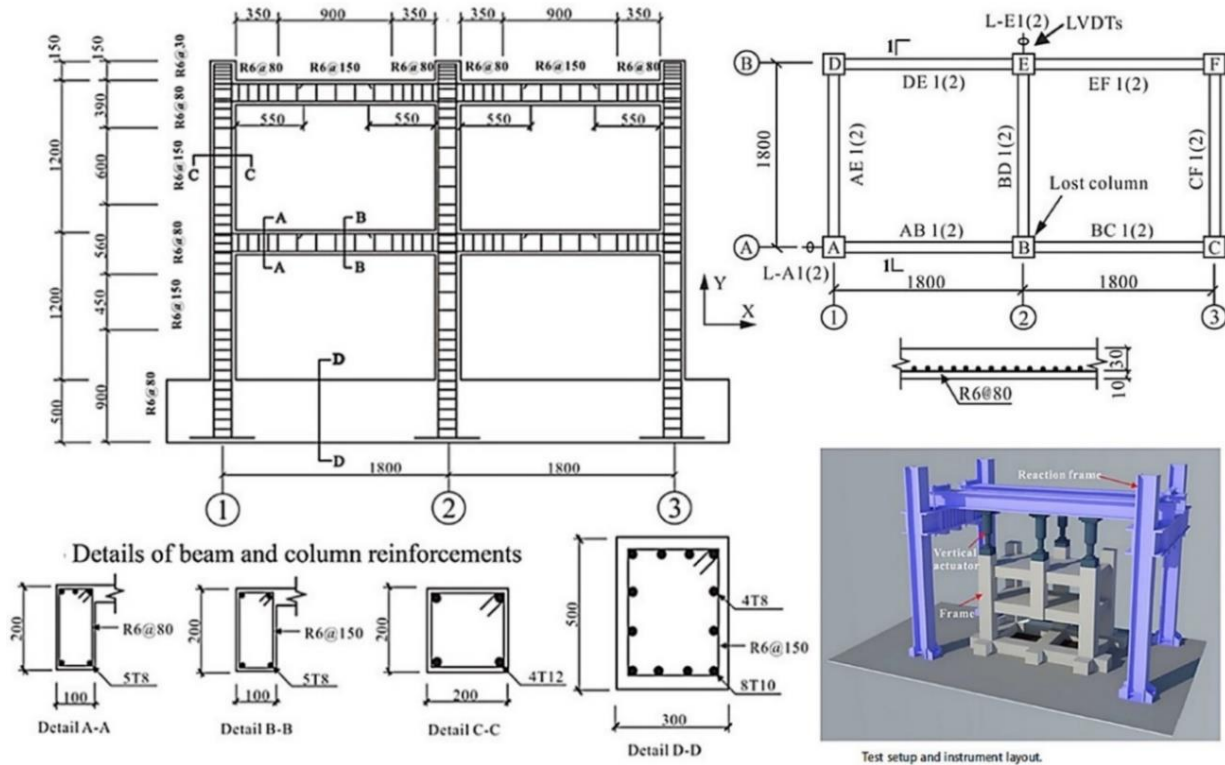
Dimensional details of RC frame structure columns and slab, and loading setup [24].
